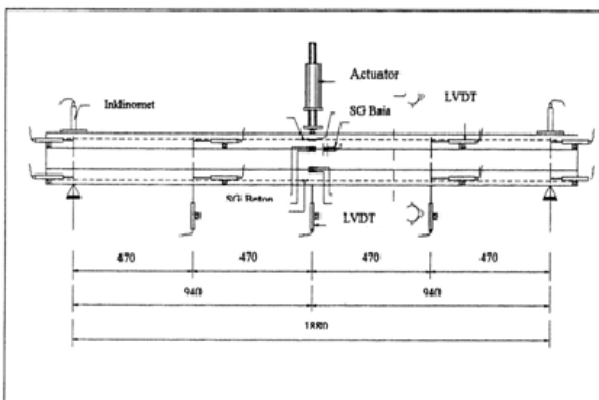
Position of the measurement apparatus in sandwiche concrete beam testing
